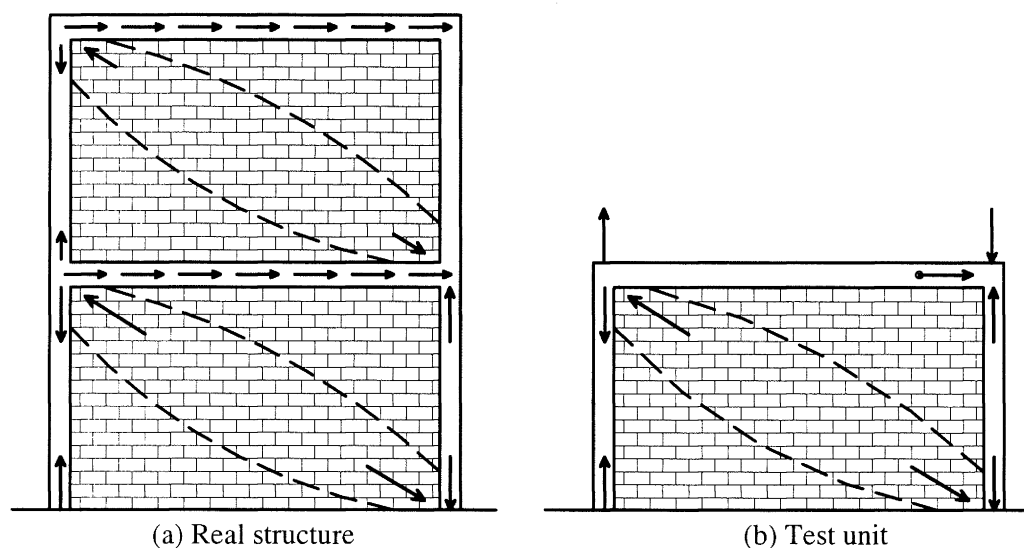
Seismic forces transfer via a truss mechanisms and loading conditions for the tests.
